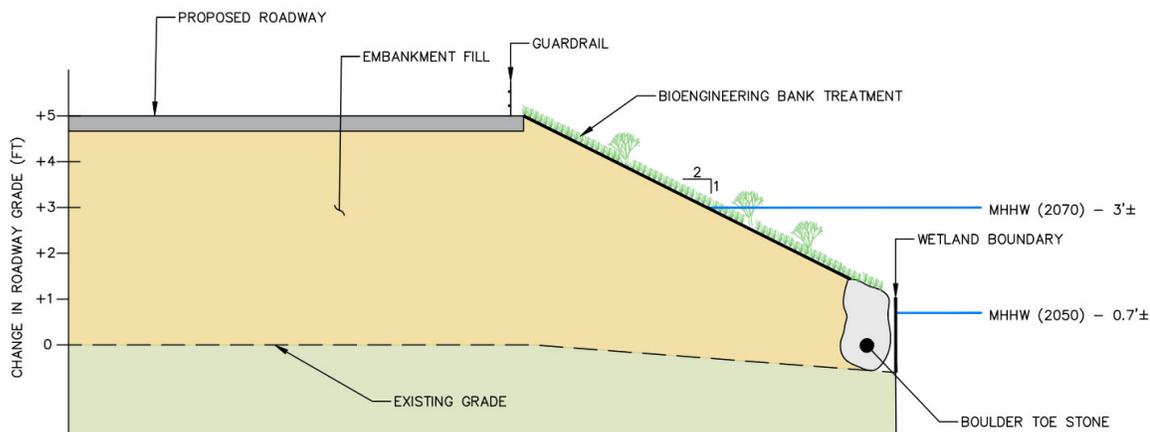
Representative cross section of Alternative 2: Raising the Road to Elevation 9.0
